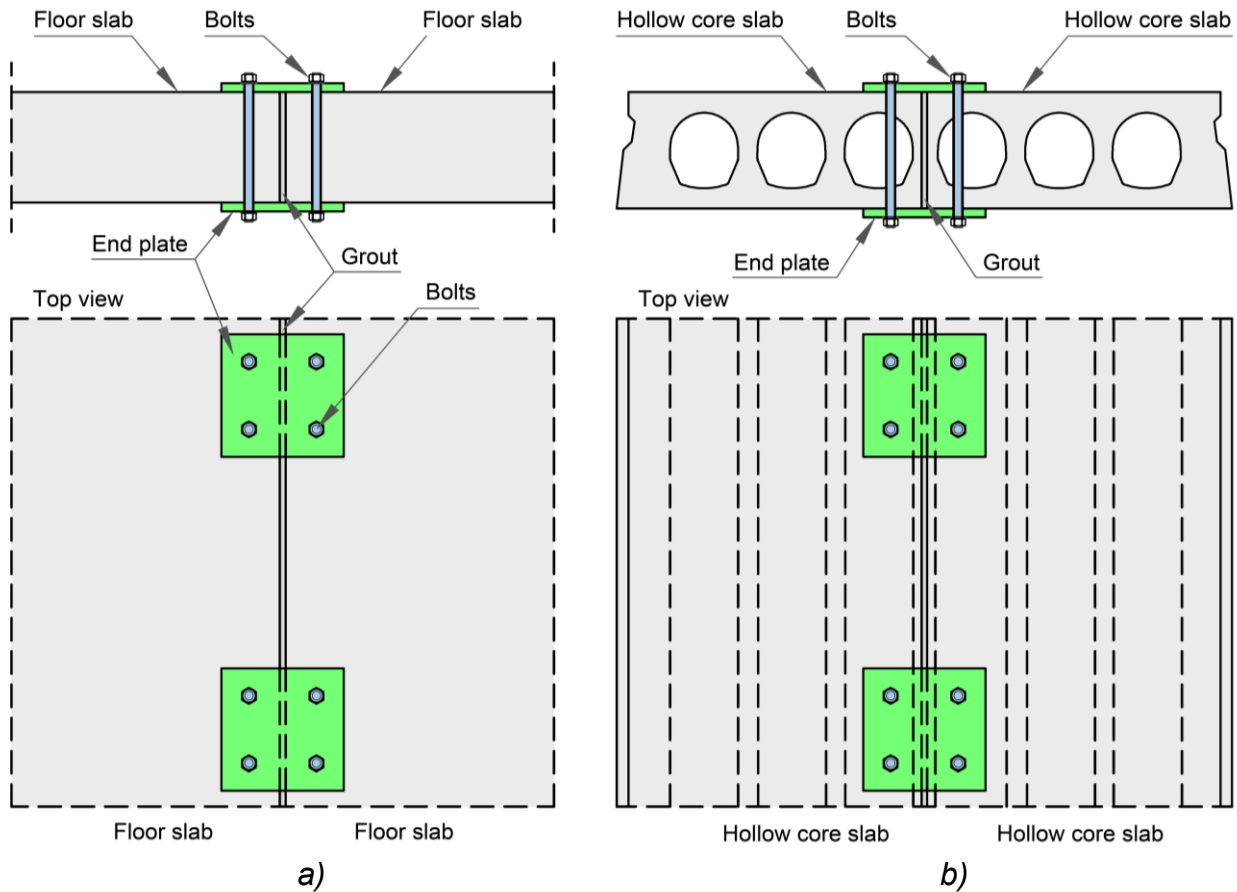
Layout of conceptual design of removable slab-to-slab connections: a) solid reinforced concrete slab segments, b) HCS segments - adapted from [23]–[25]
